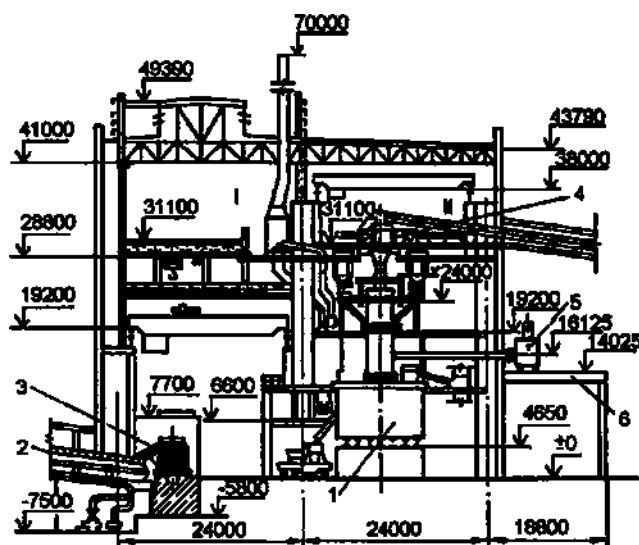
Schematic of a typical smelting plant with high-power rectangular furnaces of 63 MVA. I, tapping yard; II, furnace section; 1, furnace; 2, casting machine; 3, ladle; 4, conveyor charge feeder; 5, electric transformer; 6, power section support. Dimensions in mm. (By permission of Gladkih et al., 2007.)
